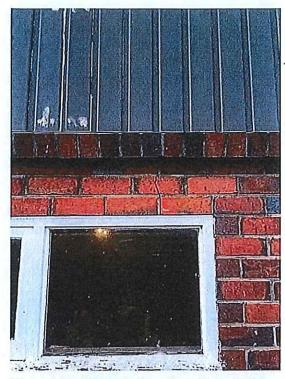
General view of south west face at location of crack shown in Photo 13 and movement to timber cladding.
